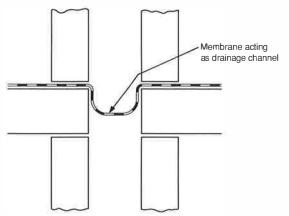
Radon-proof barrier continued across party wall and acting as drainage channel
